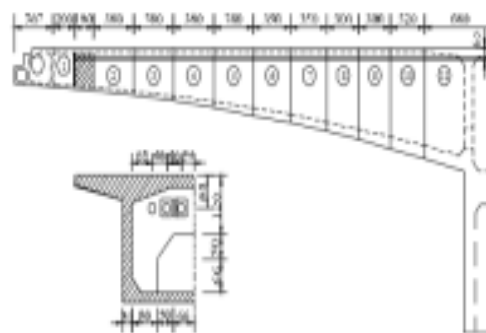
The layout of span strengthening by using external prestressing tendons [41]
